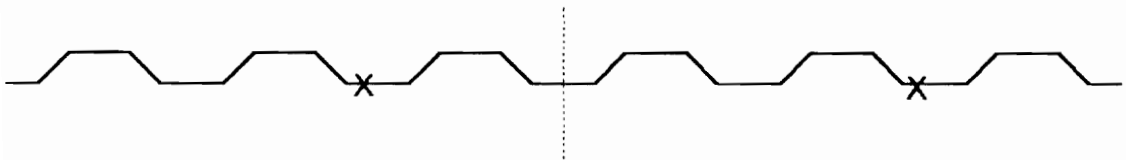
SDI-2/20-2-9 Concrete Strain Gage and Shear Stud Locations
